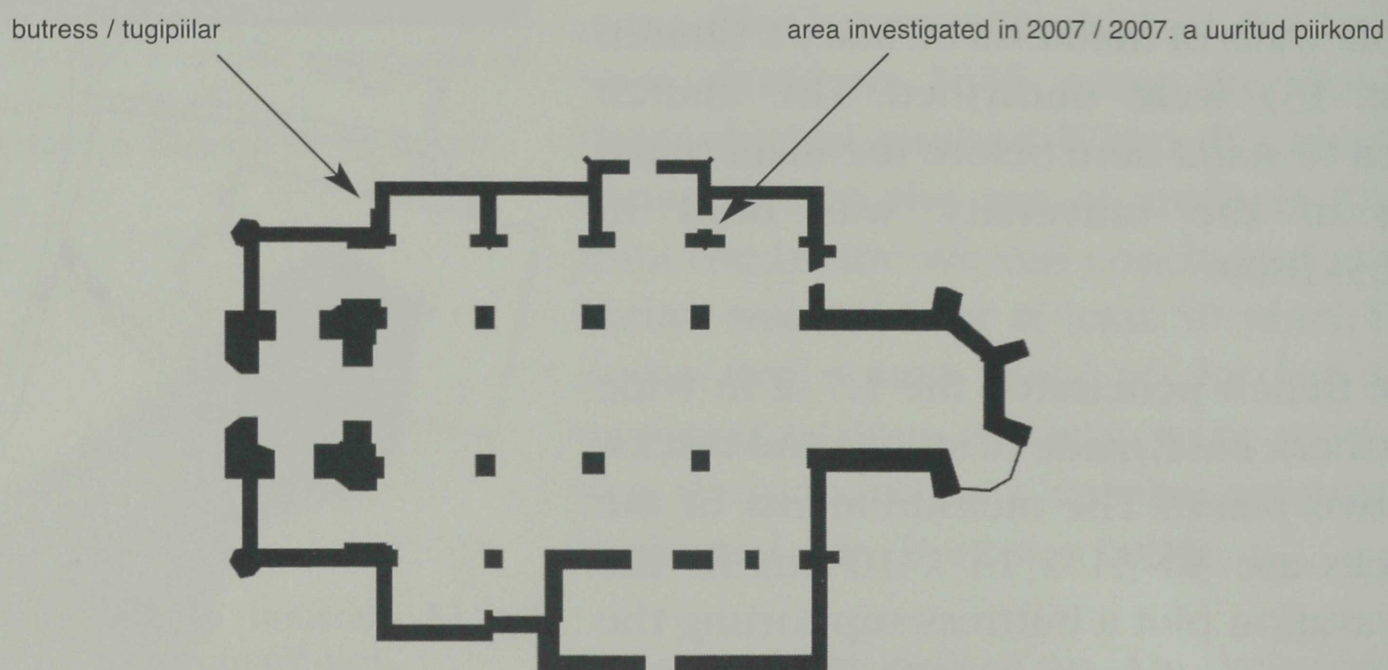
Reconstruction of the ground plan of St. Mary's Church, based on the plan from 1763.
